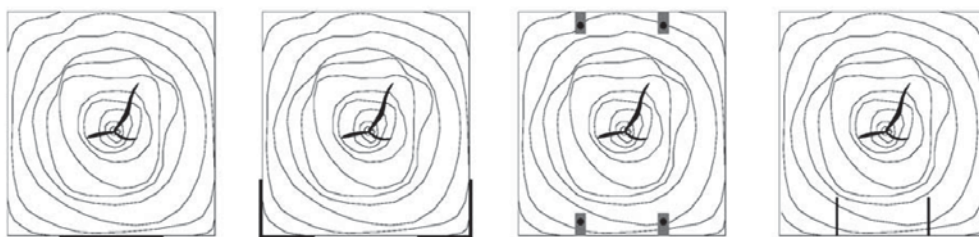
Outline of the timber section strengthened with FRP sheet or near-surface mounted bar.
